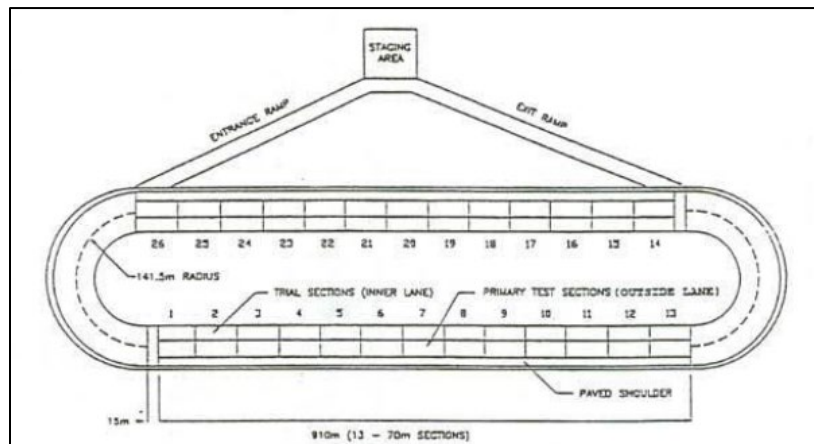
Layout of WesTrack Test Sections (Metcalf, 1996).
